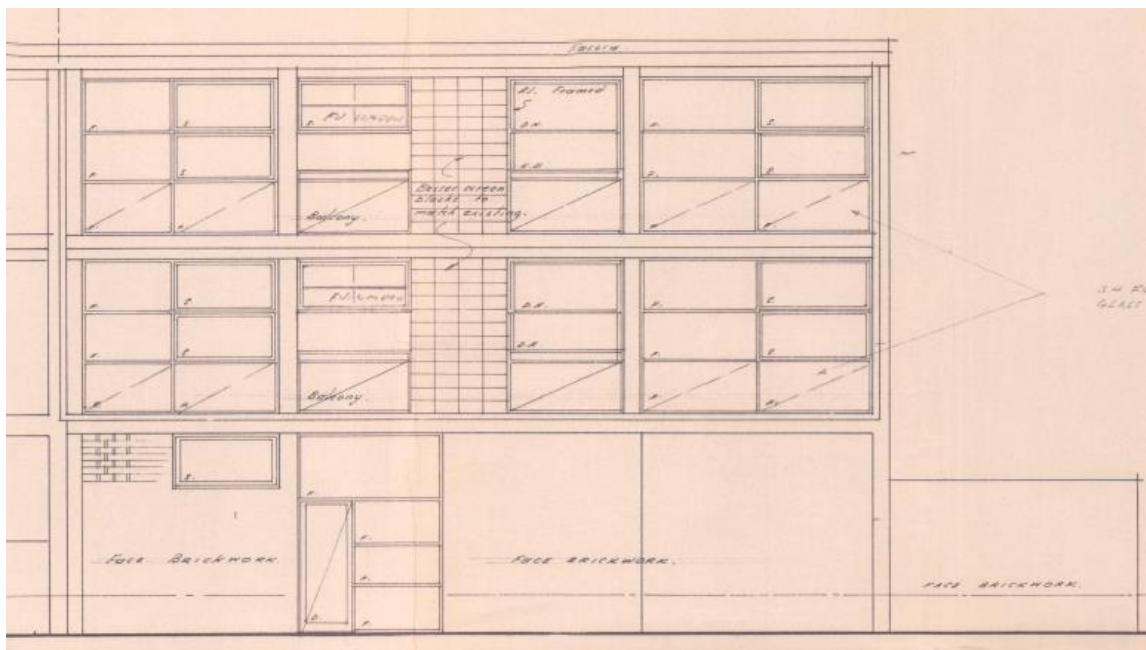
North elevation of rear extension, from drawings related to permit no. 1972 (M Feldhagen, 1967) (Source: Council Building File)
